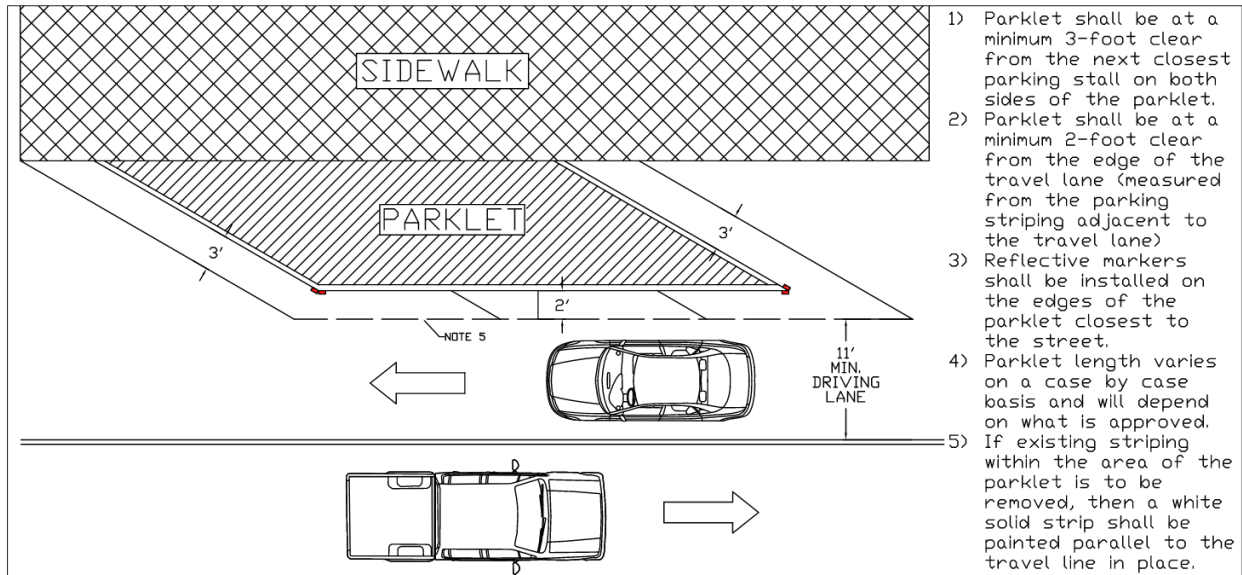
Example of Parklet Placement in Angled Parking Stalls
